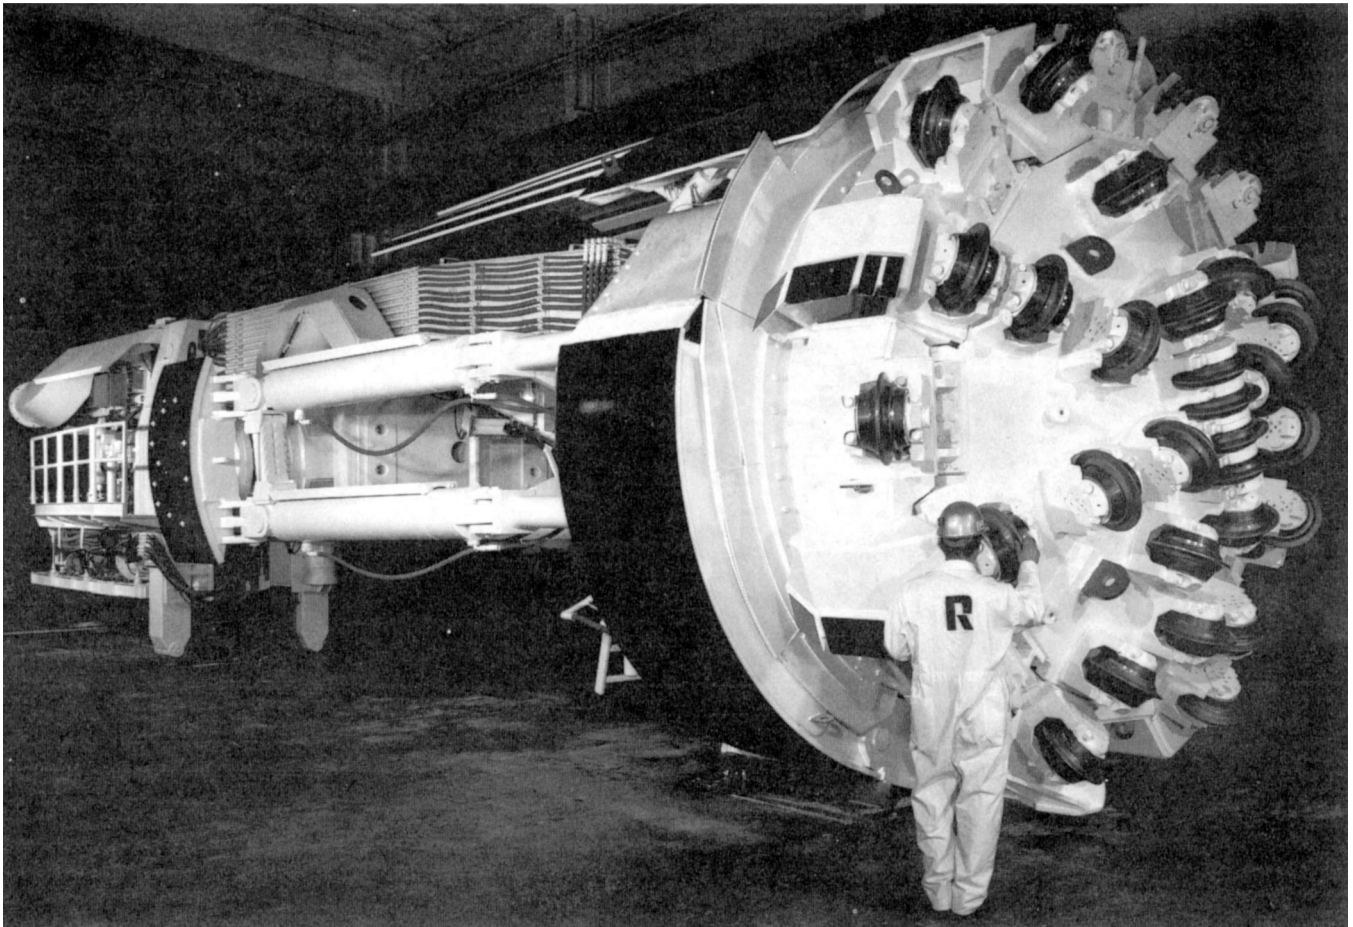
A tunnel boring machine (courtesy: Robbins Co.)
